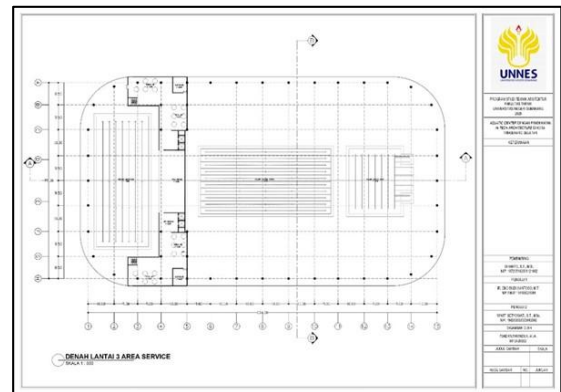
3<sup>rd</sup> Floor Plan Main Building
